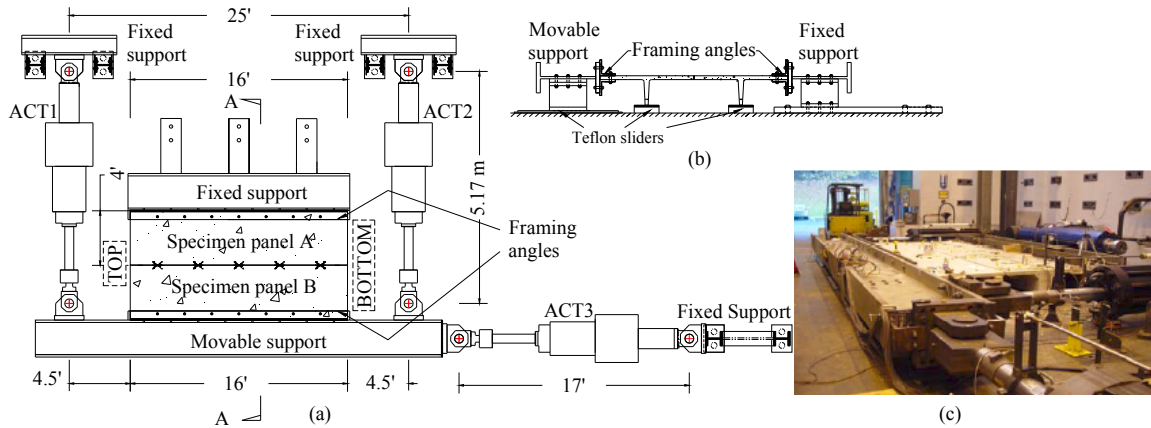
Test fixture: (a) plan; (b) section; (c) photo.
